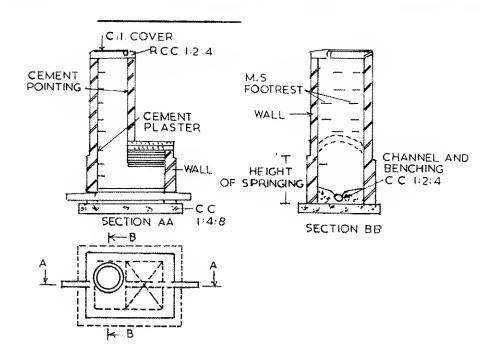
TYPICAL ILLUSTRATION OF ARCHED TYPE MANHOLE
